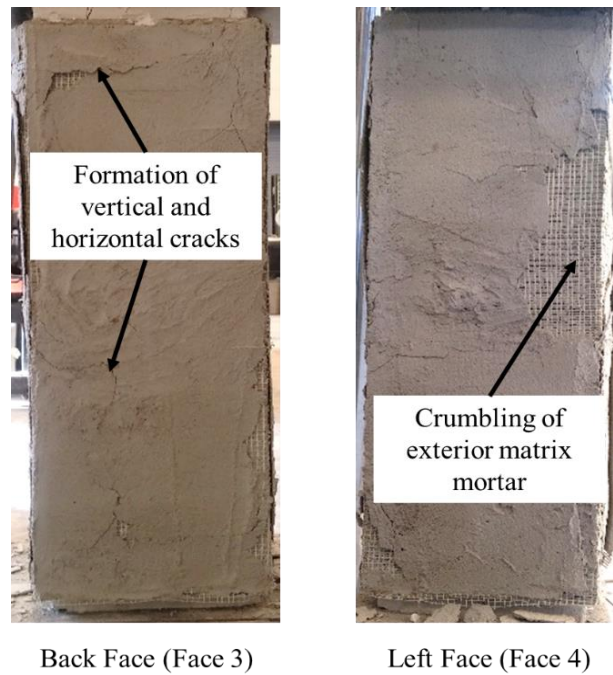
Specimen C-12-0-1-4 After Testing: Back and Left Faces
